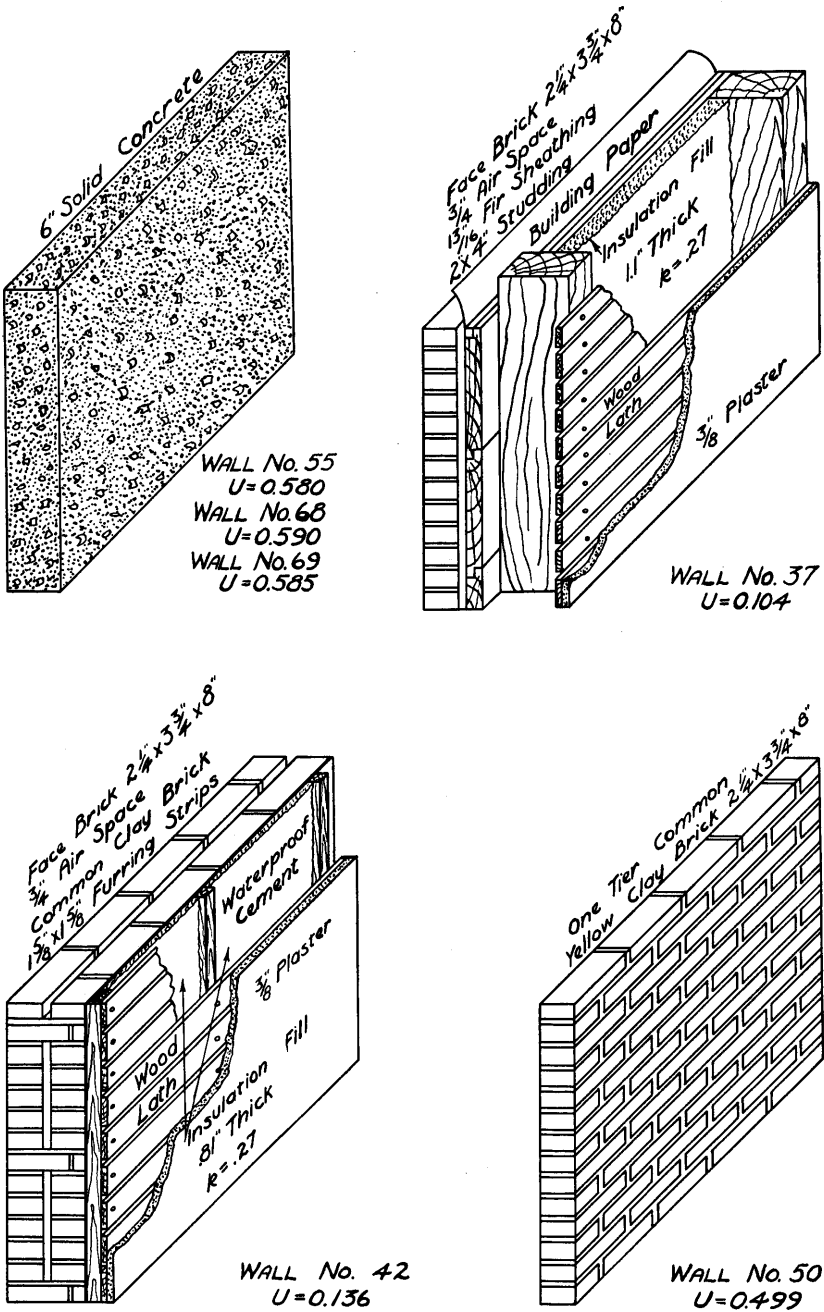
SECTIONAL VIEWS OF TEST WALLS
